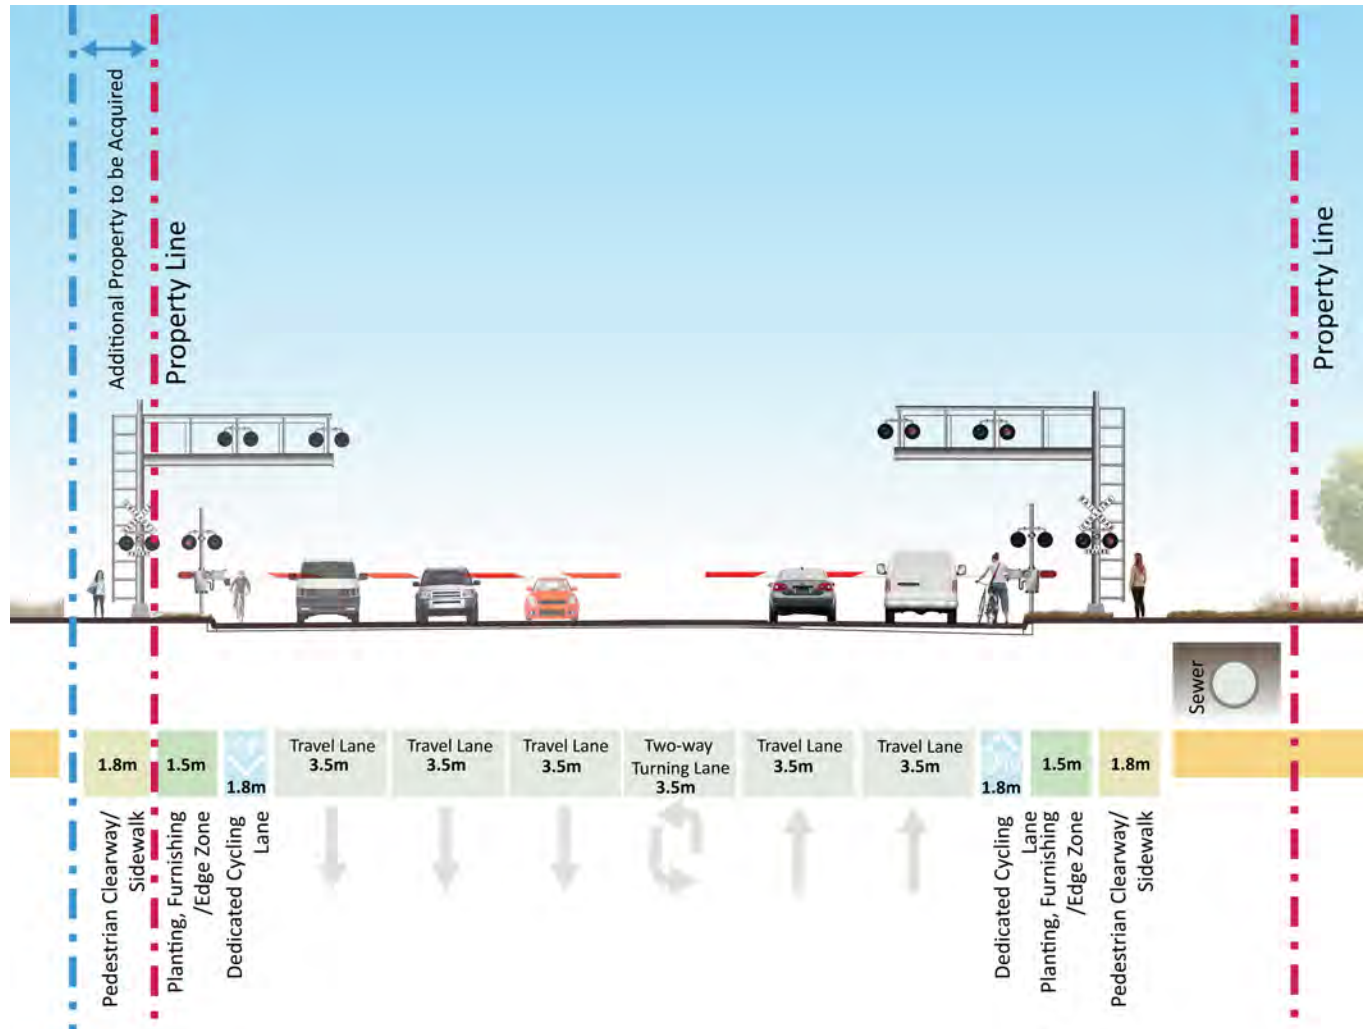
Future Stage Cross Section - Casablanca Boulevard at the CN Rail Crossing
